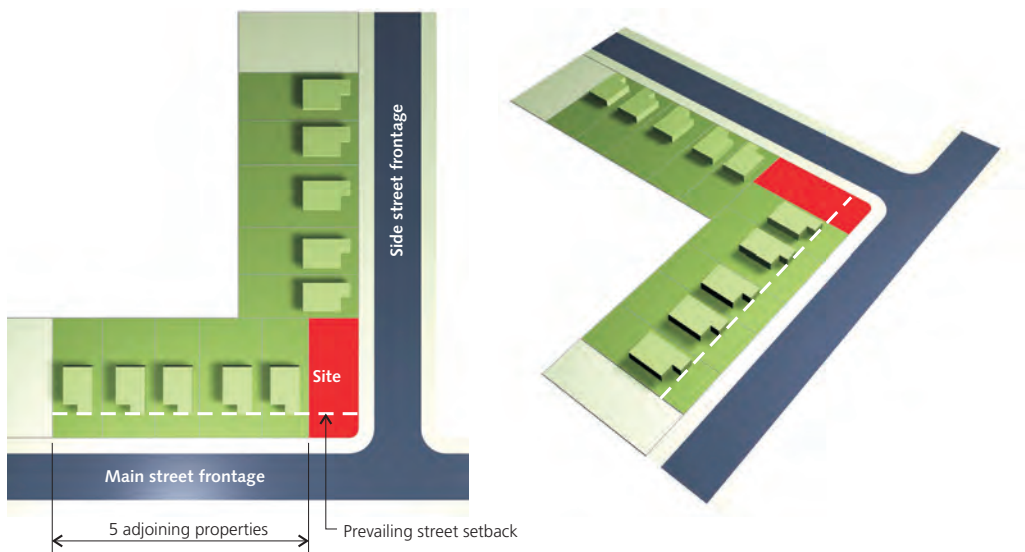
Calculation of the prevailing street setback on a corner development site
